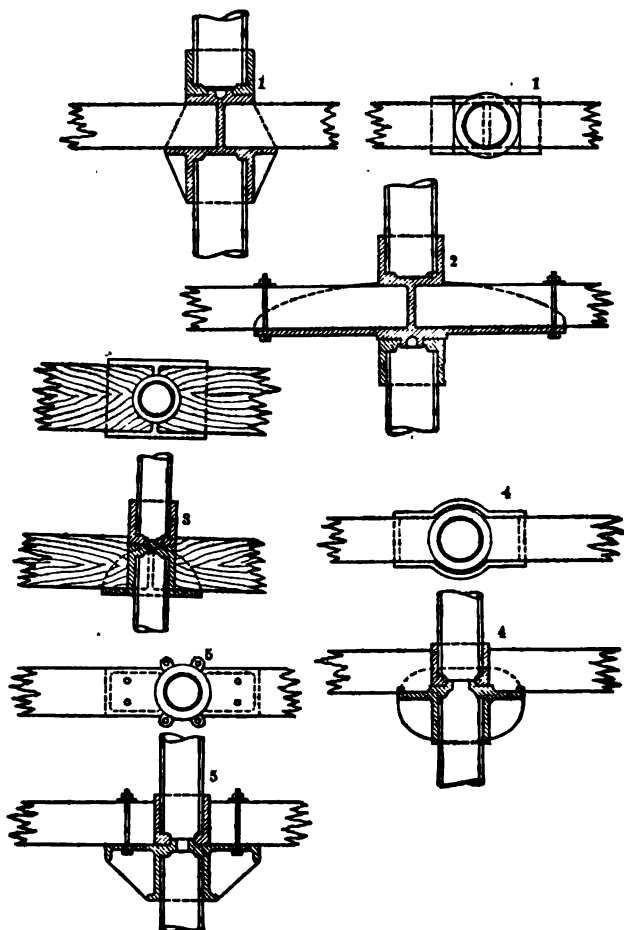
Connections, Caps and Bases for Steel-pipe Columns
